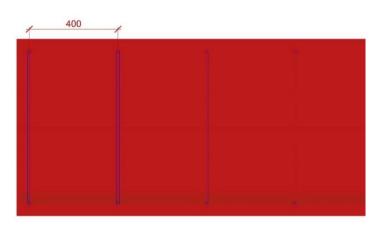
Longitudinal section of the deck beam, zoomed in. Units in mm. Figure 49: Longitudinal section of the deck beam.
